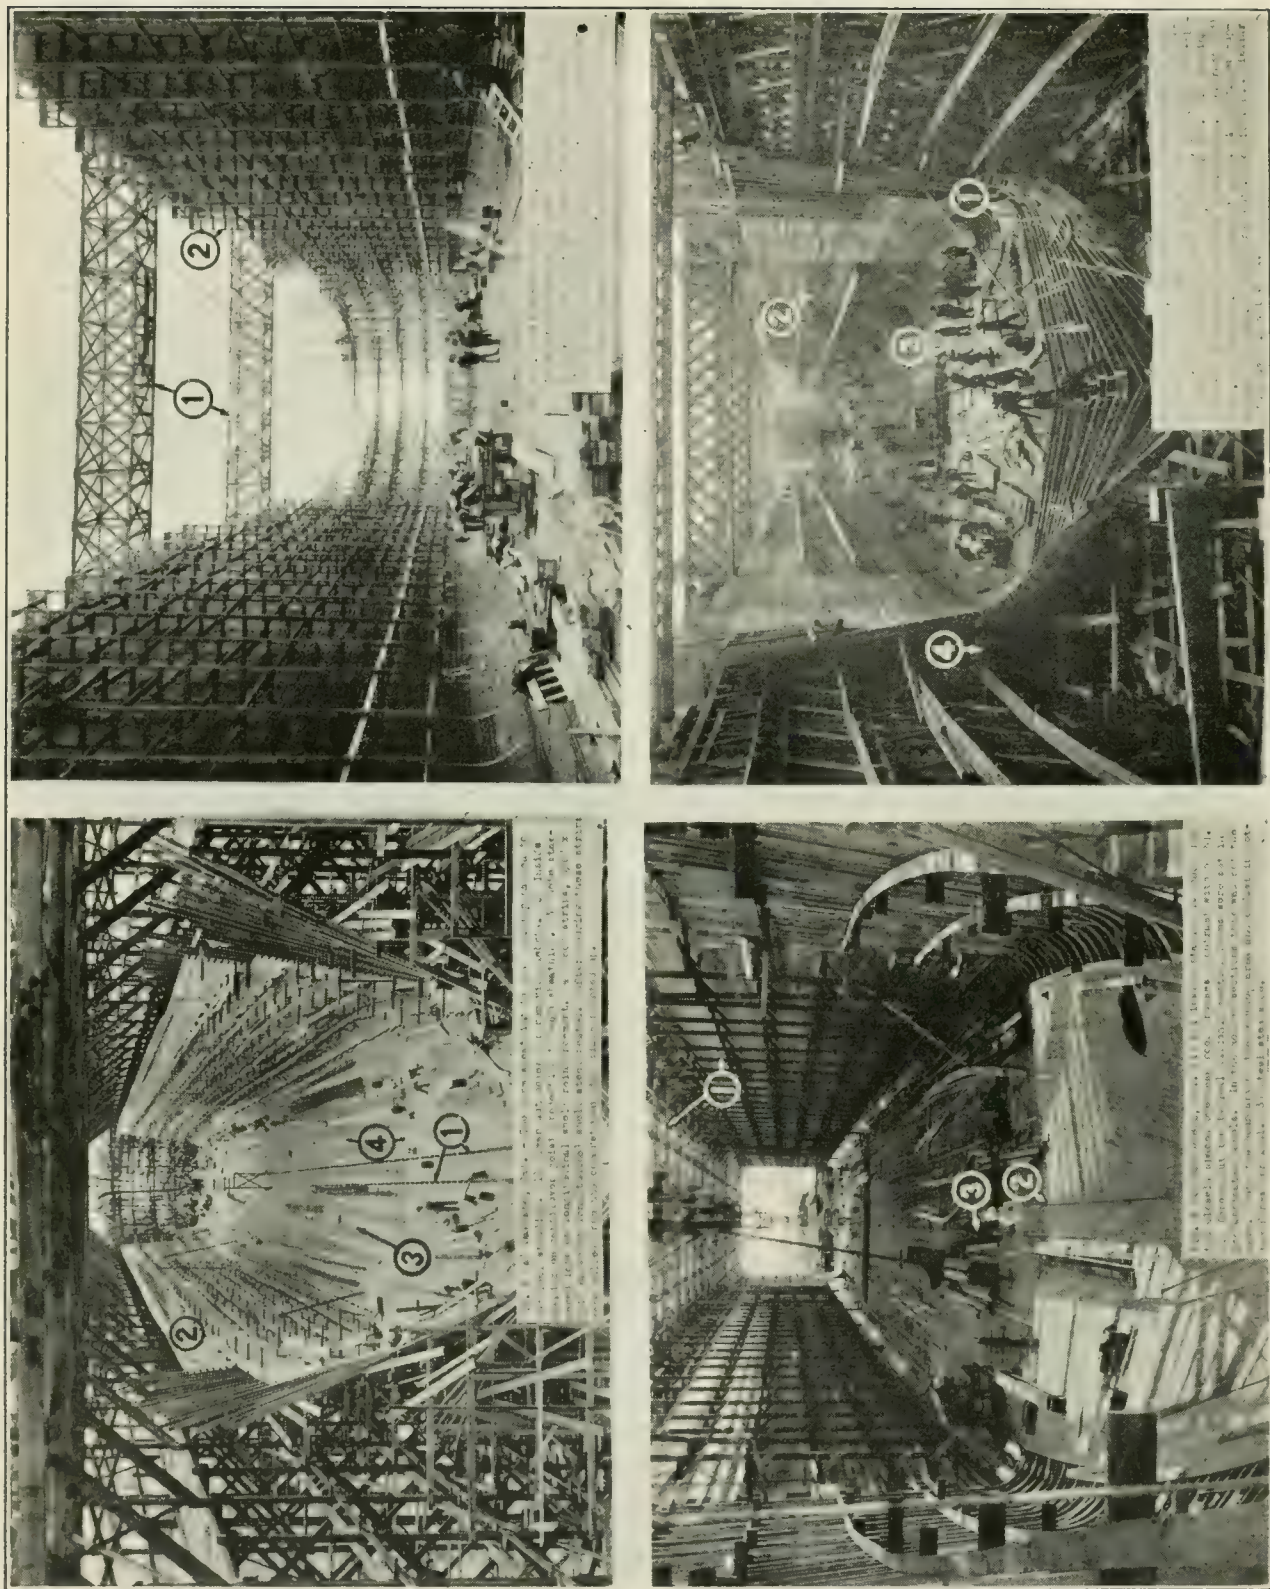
OUTSIDE BOTTOM AND SIDE FORMS ARE ERECTED COMPLETE.
